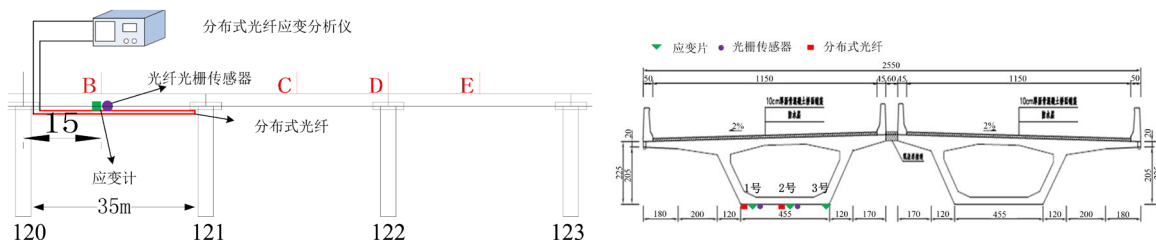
Main line 28th sensor installation diagram (upper elevation, bottom section)
